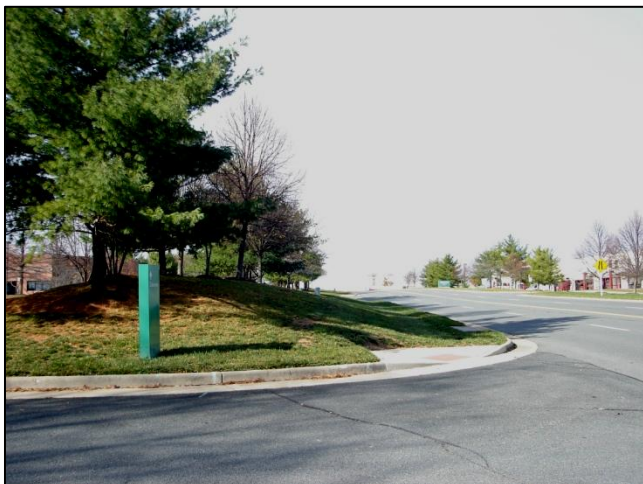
Bermed buffer along Guilford Drive and the east side of the subject property. Note the accessible curb at corner, but no pedestrian path or crosswalk.
